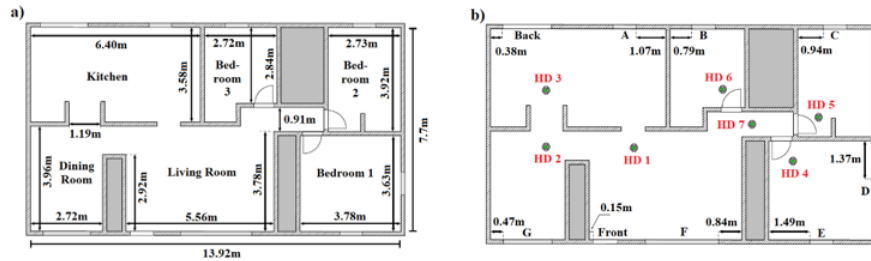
Plan view dimensioned drawing of a) the single story structure and b) vent openings with heat sensors (HD) [56].
